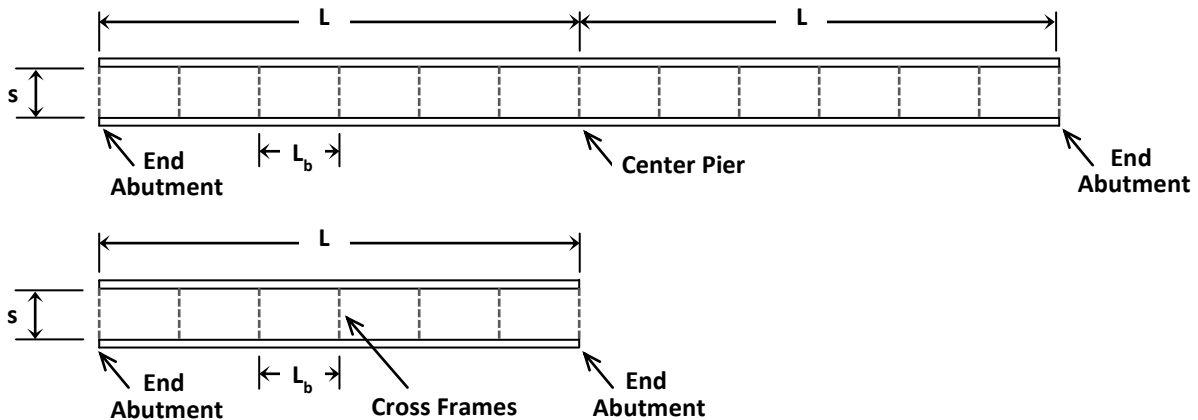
Bridge Layout for Both the Simply-Supported and Continuous I-Girder Systems
